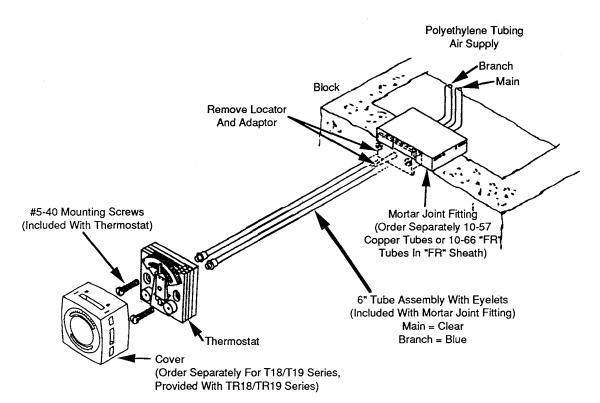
Typical Mortar Joint Fitting in Masonry Wall.
